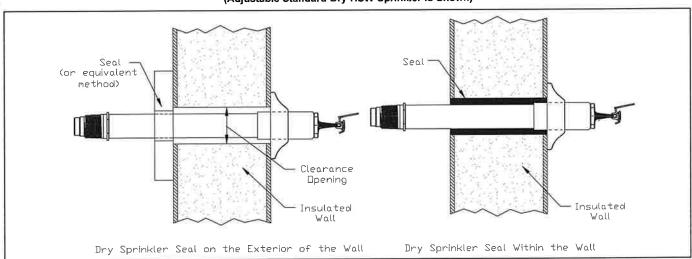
Dry Sprinkler Seal (Adjustable Standard Dry HSW Sprinkler is Shown)
